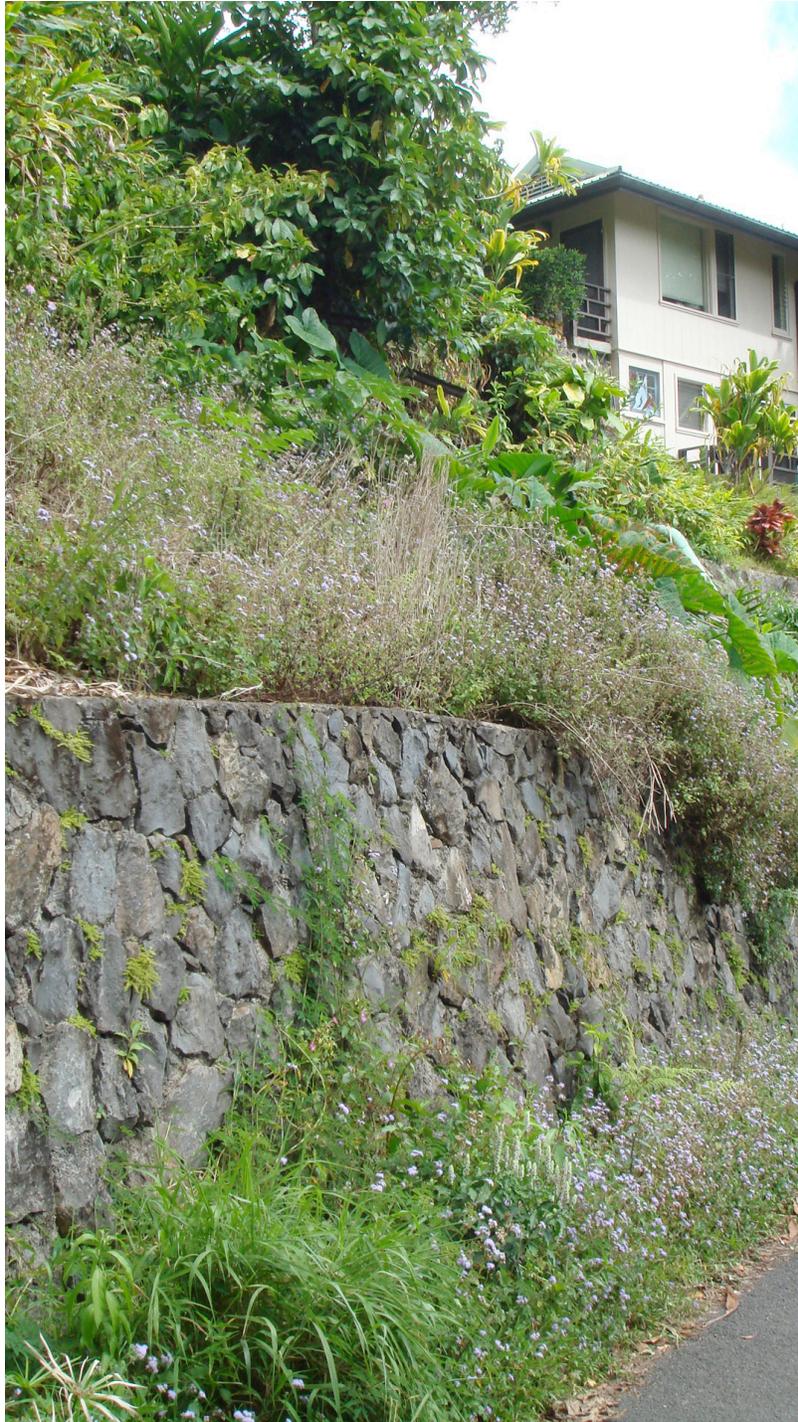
Existing Re-vegetated Slope Between Kalaiopua Place & Applicant’s Driveway (Above)
